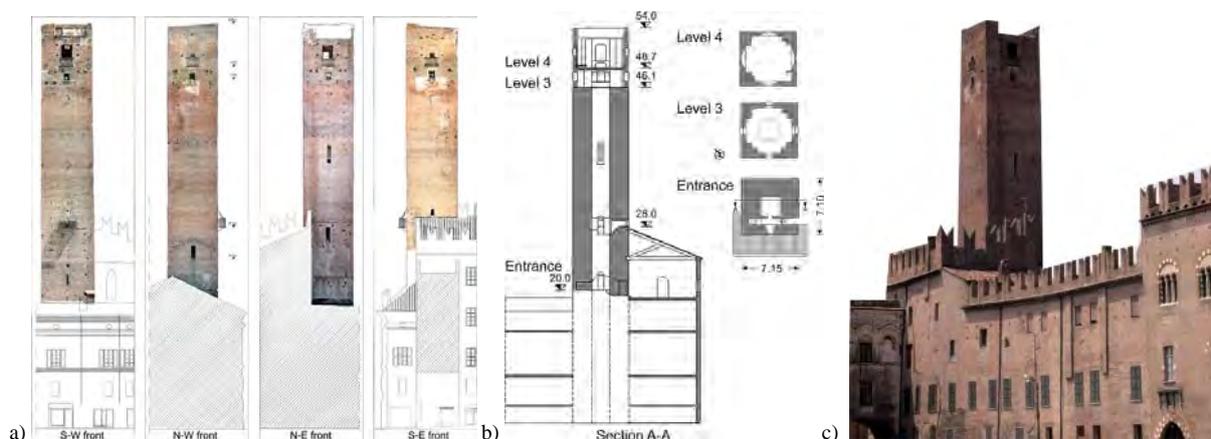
Fronts (a) , section (b) and view from East (c) of the Gabbia Tower.
